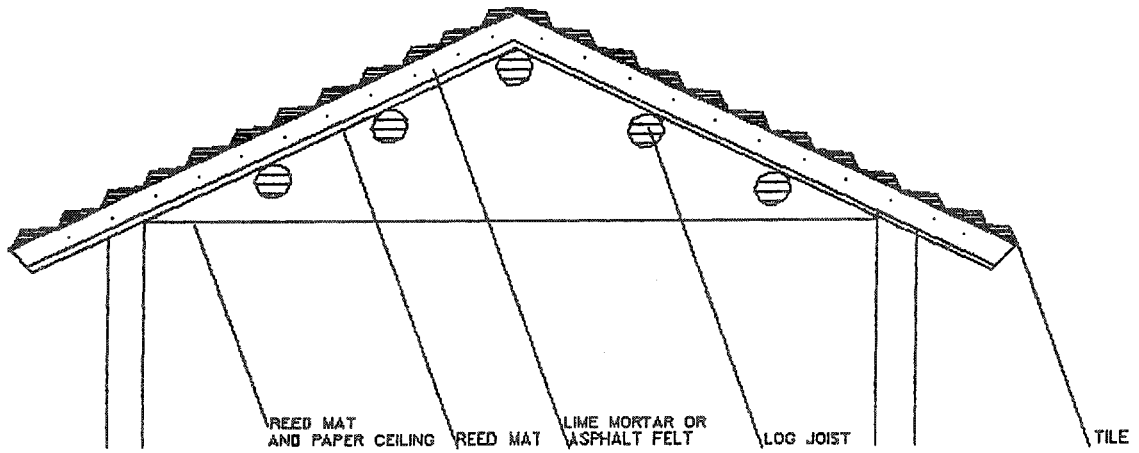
TYPICAL PEASANT TILE ROOF: VERTICAL PROFILE
